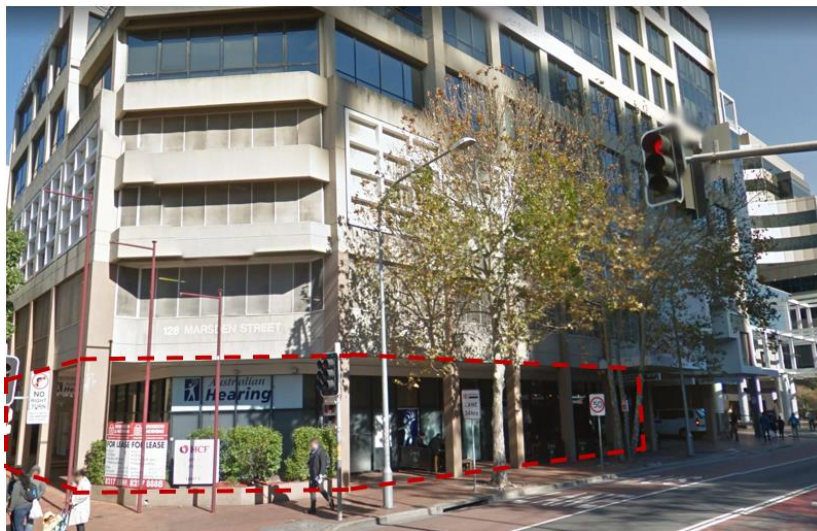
Proposed colonnade to be filled-in viewed from the corner of Argyle and Marsden Streets
